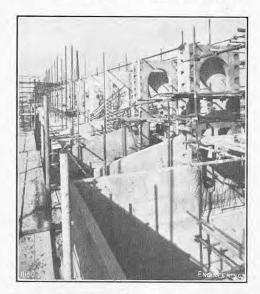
Erection of Main-Beam Prestressing CABLES.
